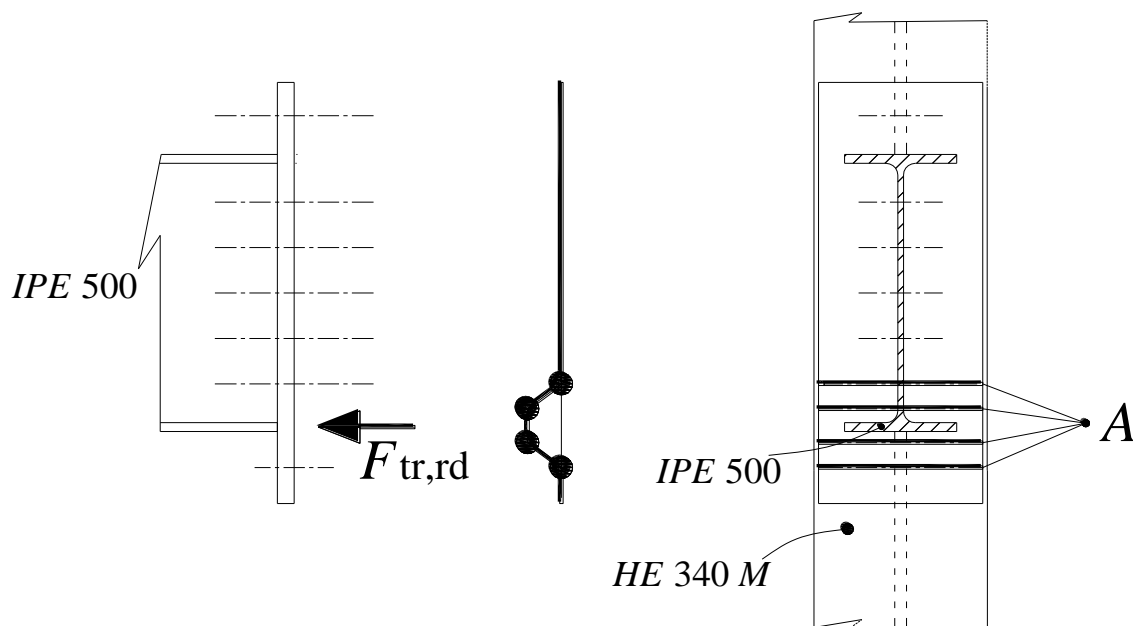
Plastic deformation mechanism in the end plate of the IPE500 beam
